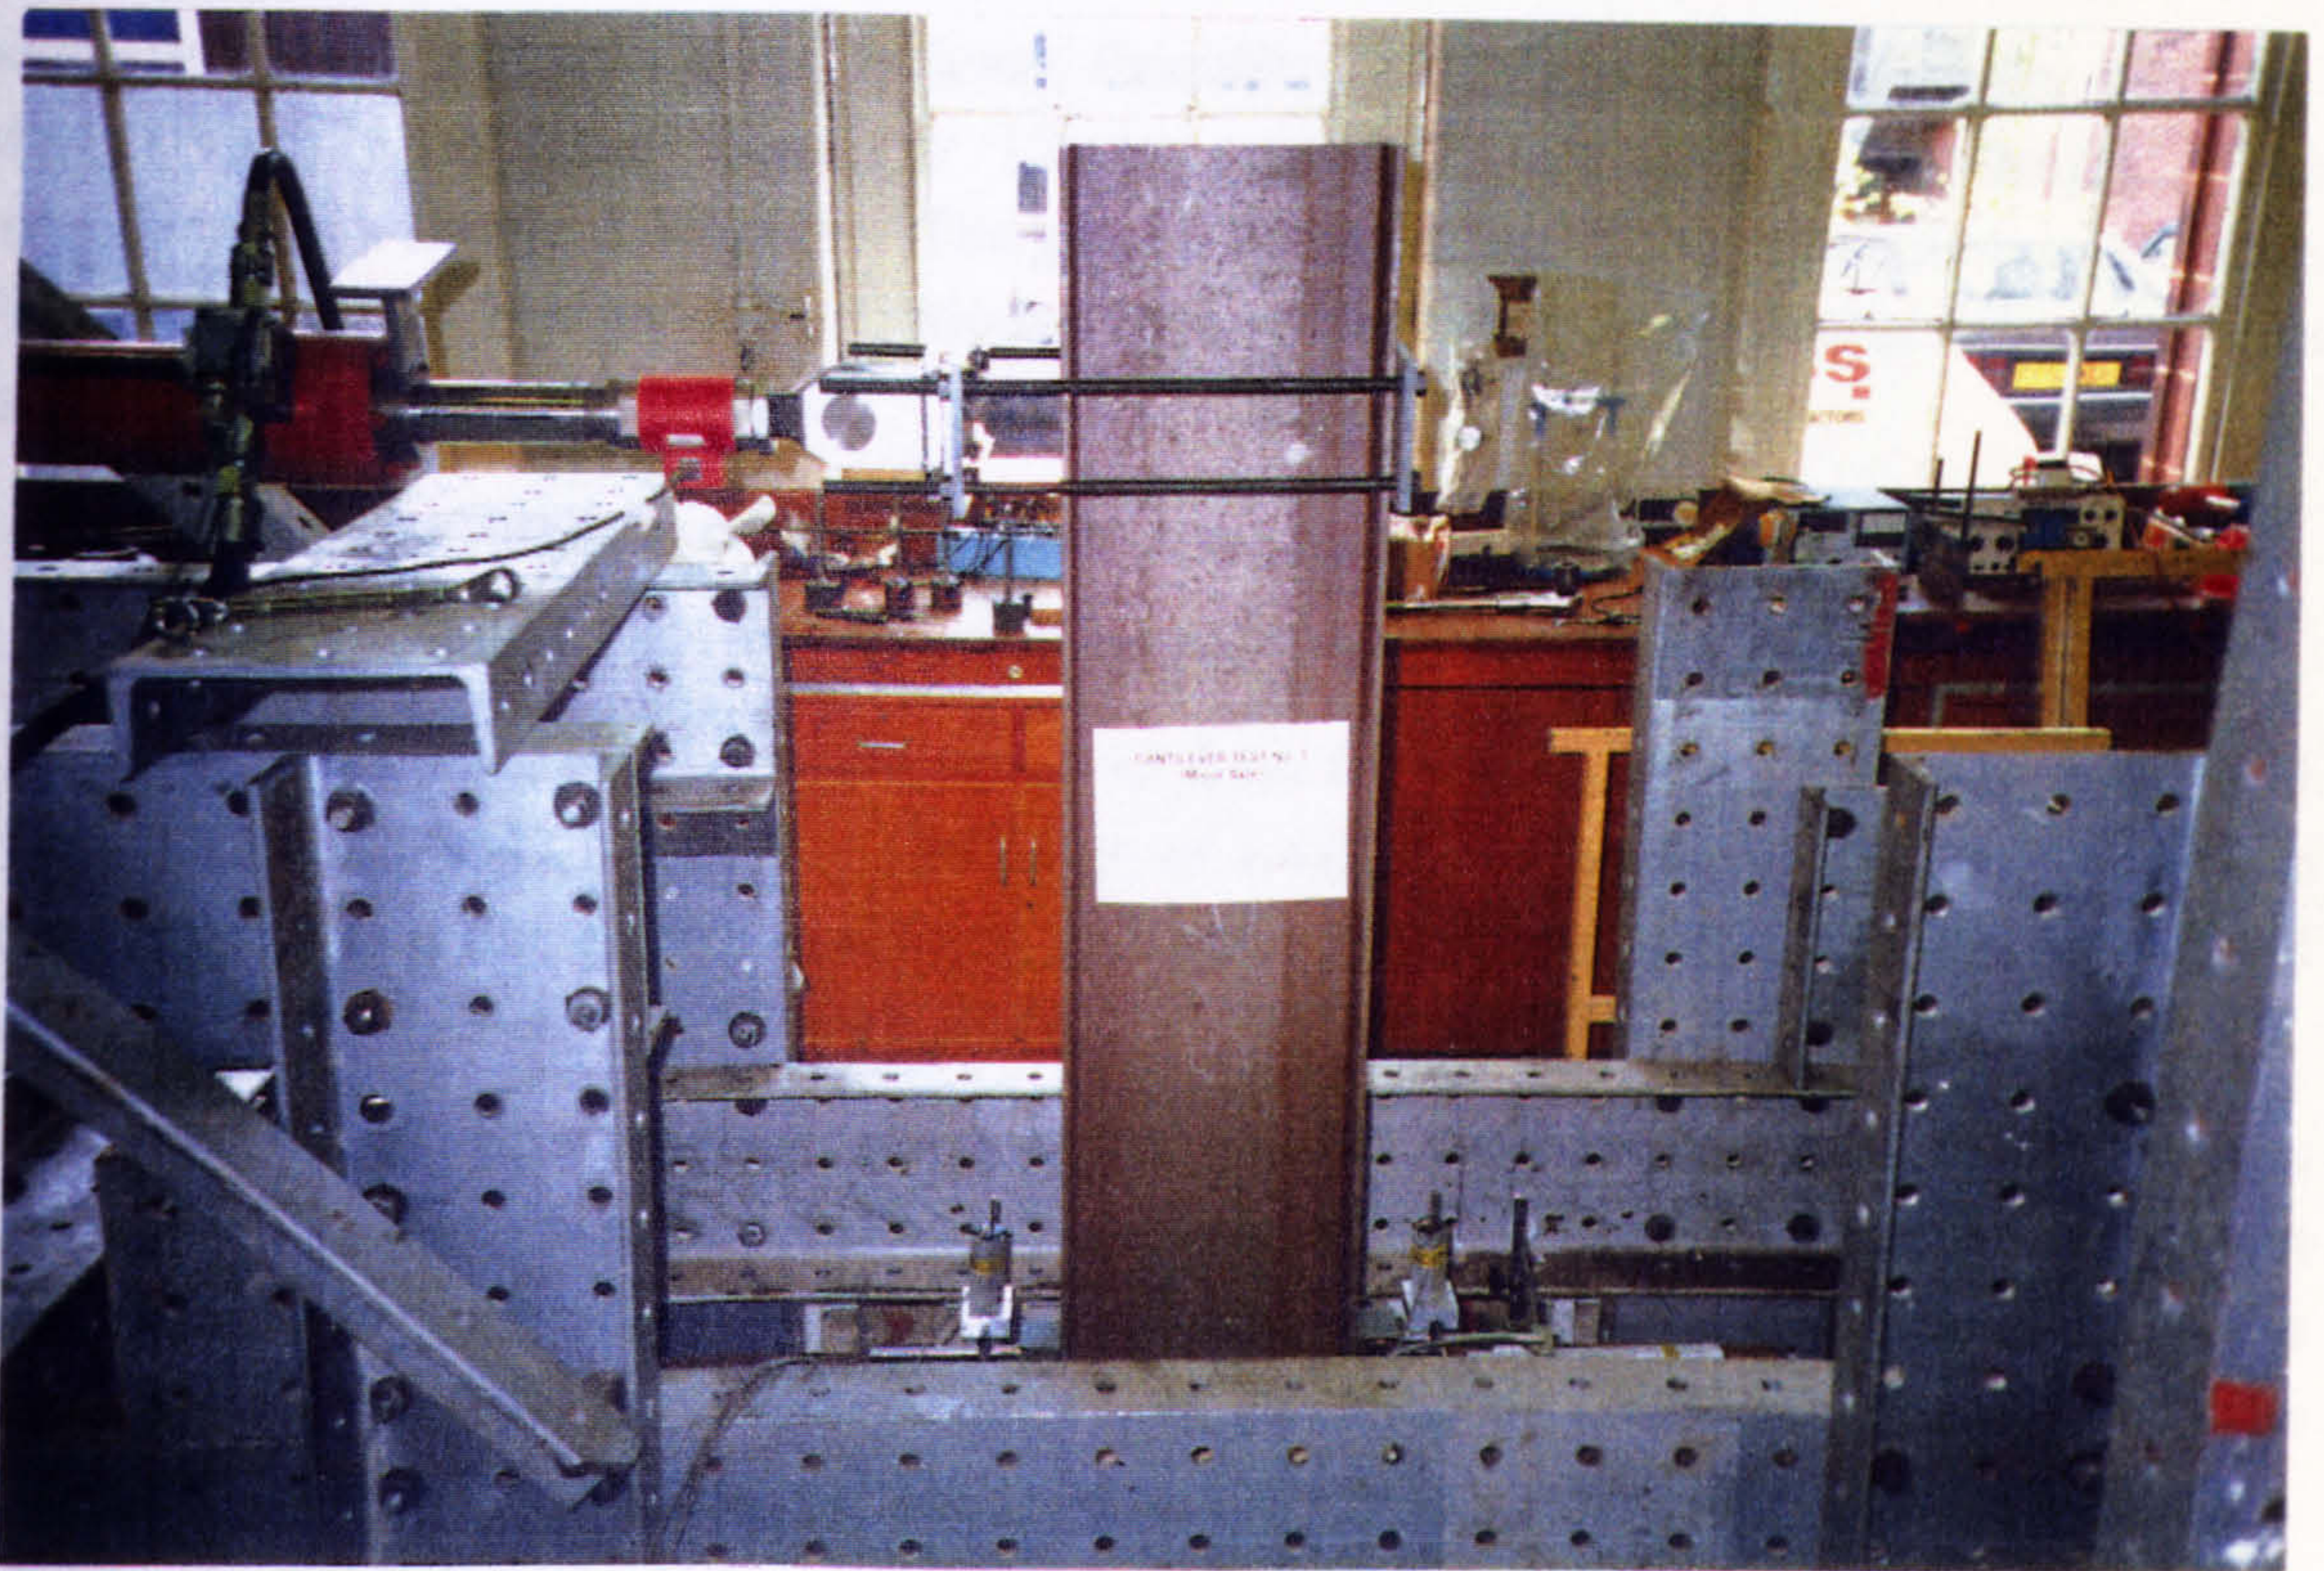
Ambient-Temperature Cantilever Beam-to-Column Test Arrangement
